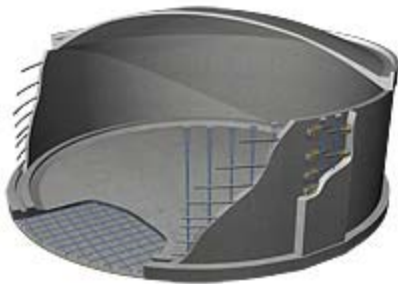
Examples of rebar arrangement in concrete tanks.
